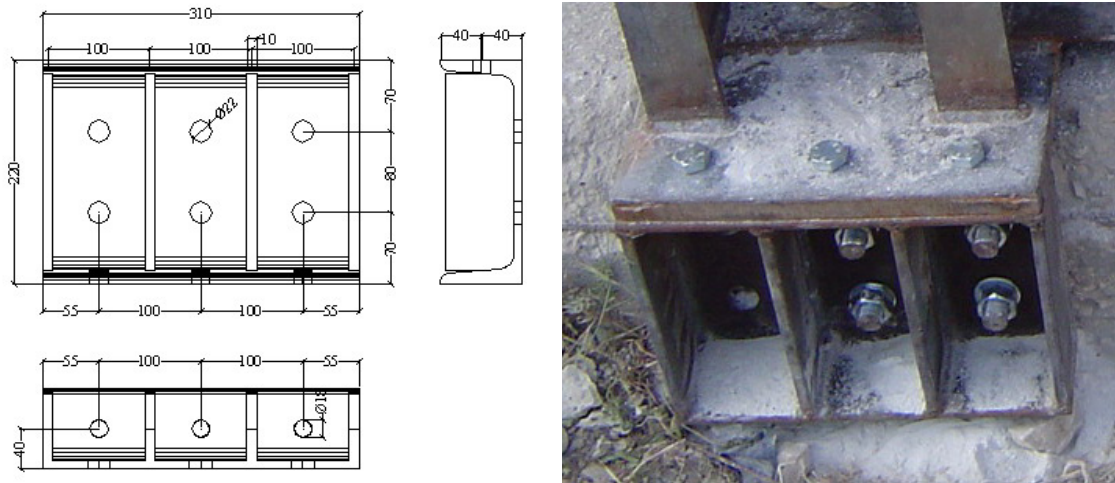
Reaction Steel Frame – Foundation Beam Connection
